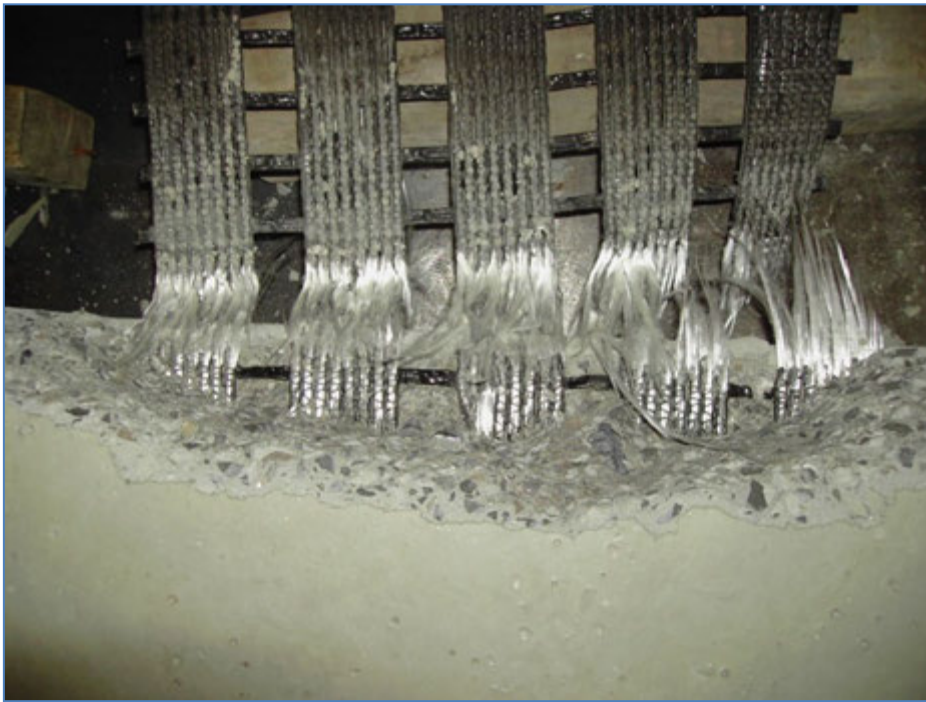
Load test on geogrid-base slab connection, showing tensile failure at the interface and concrete spalling of unreinforced part of base slab
